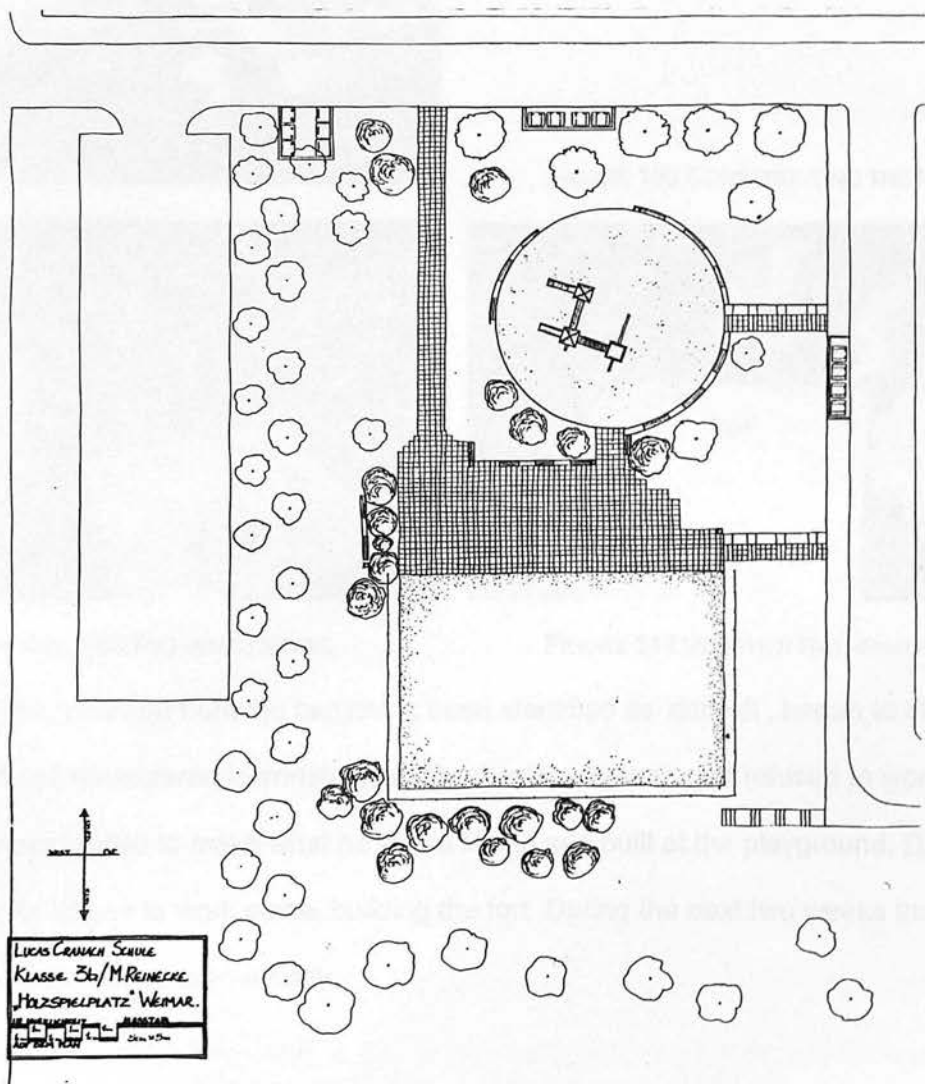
PLAN OF THE TIMBER PLAYGROUND
